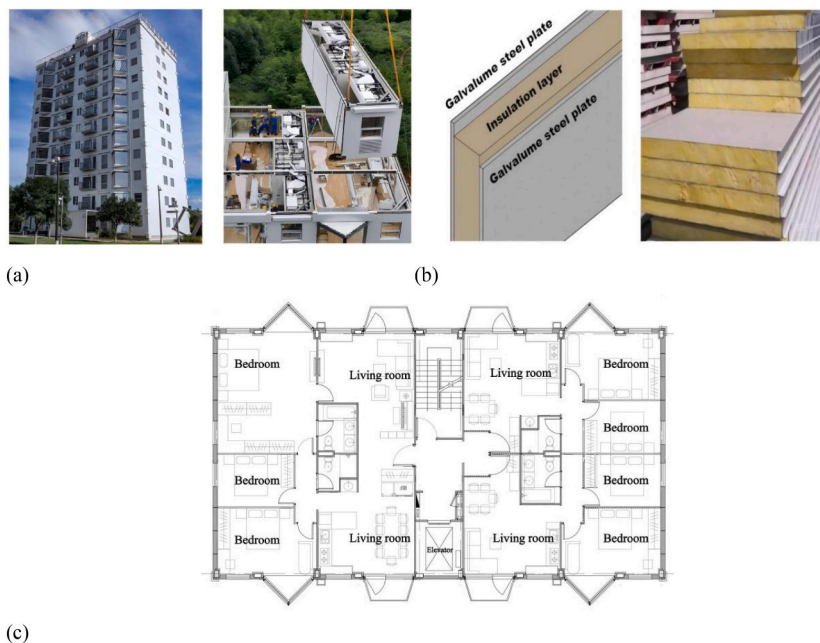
(a) Baseline building, (b) the external wall in MIC, and (c) its floor plan layout.
